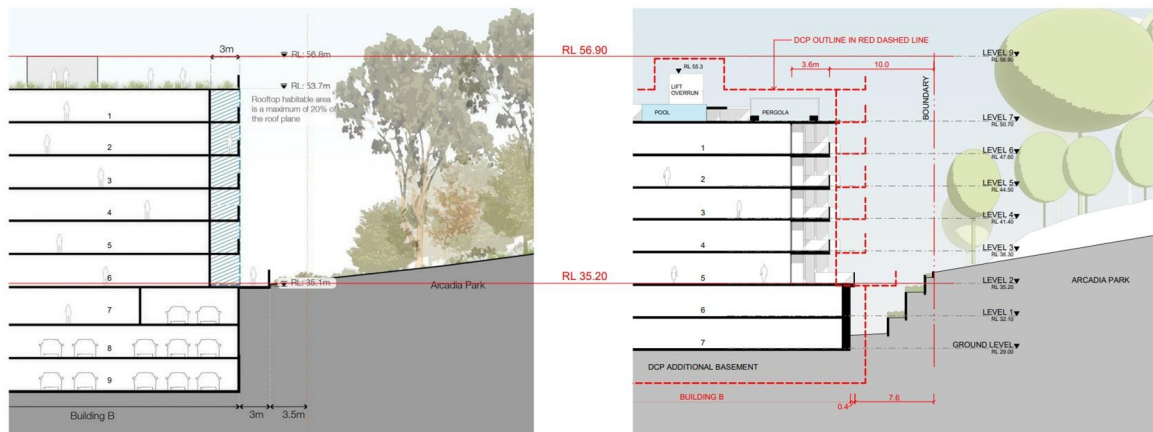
(of DCP) - Building B eastern boundary with Arcadia Park (shown left) and proposed cross section (shown right)
